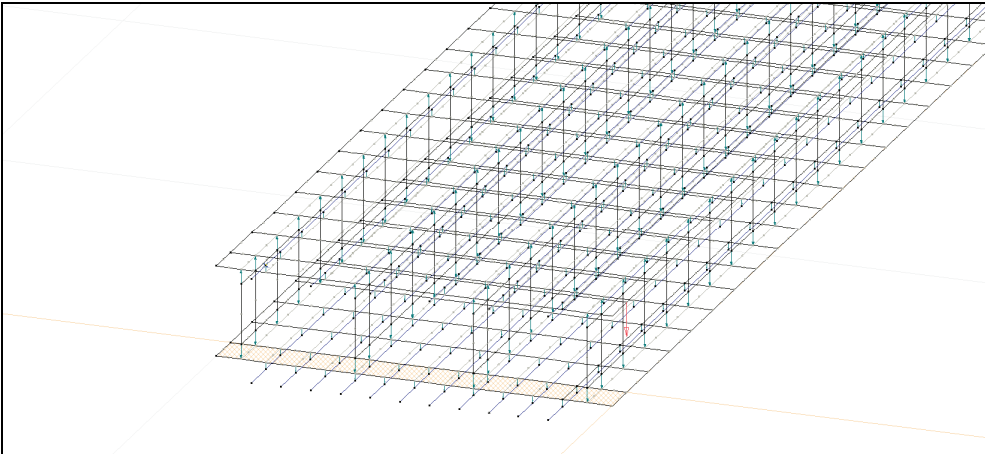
Modeling bond between concrete and steel in RC floor plate.
